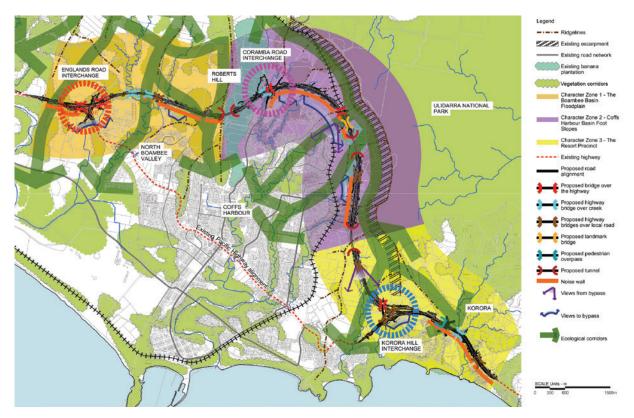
Map outlining the character zones for the draft Place Design and Landscape Plan
